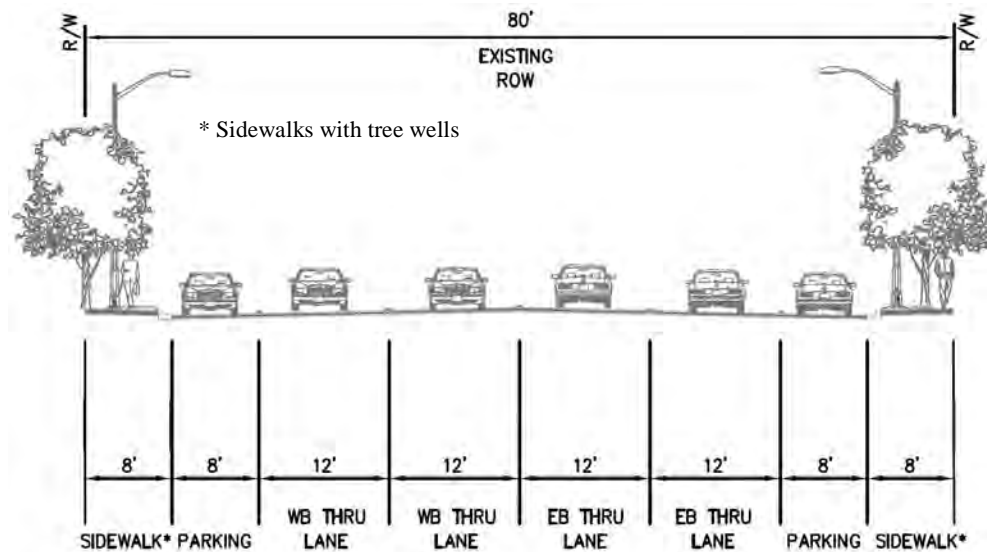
Proposed Cross Section, E Street Between 3rd Avenue and Broadway
